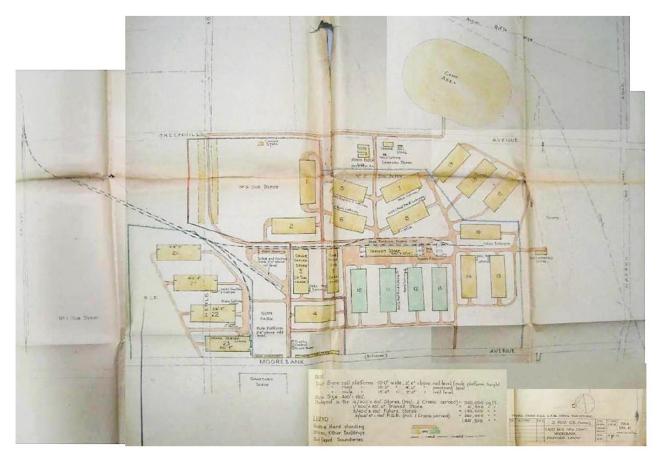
Plan of Proposed Layout of Moorebank Ordnance Depot 25/4/44 (NAA SP459/1, 420/7/1153) (Artefact 2012).
